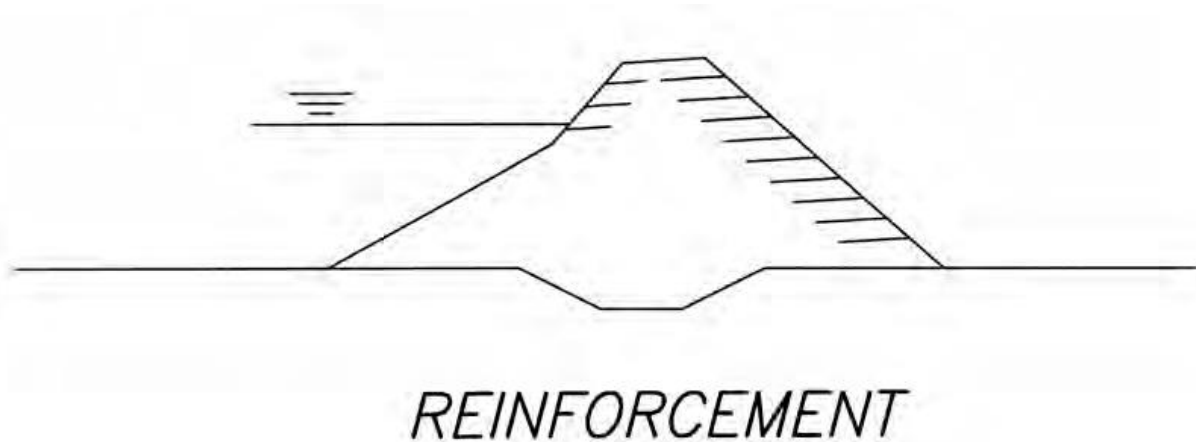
Illustration of an embankment whose slopes have been steepened by incorporating geotextile layers into the soil as slope reinforcement
